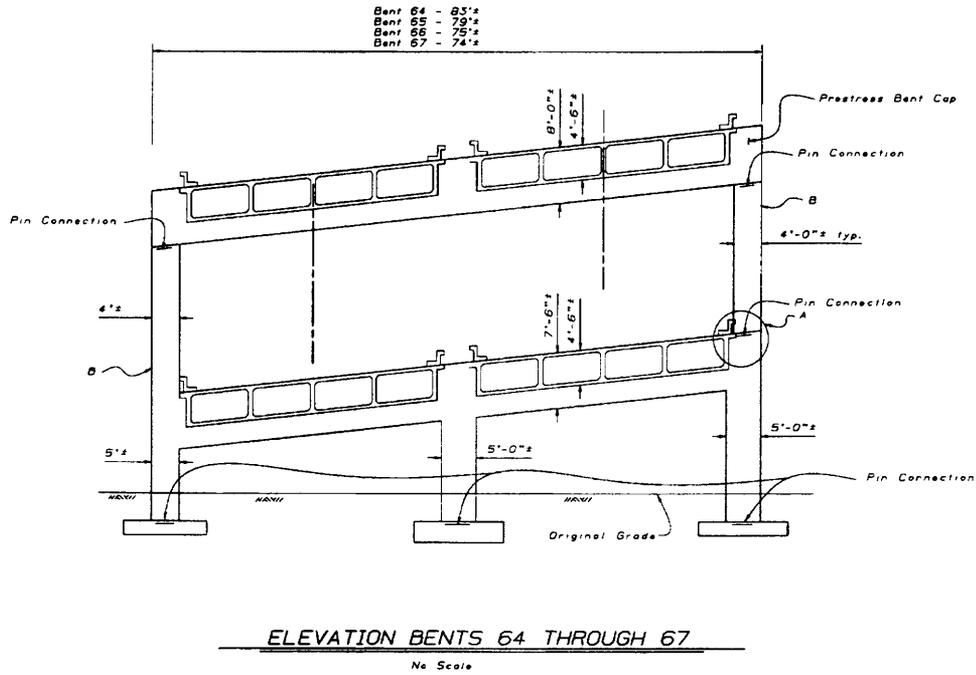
Elevation drawing of Bents 64 to 67 at Embarcadero Viaduct.
